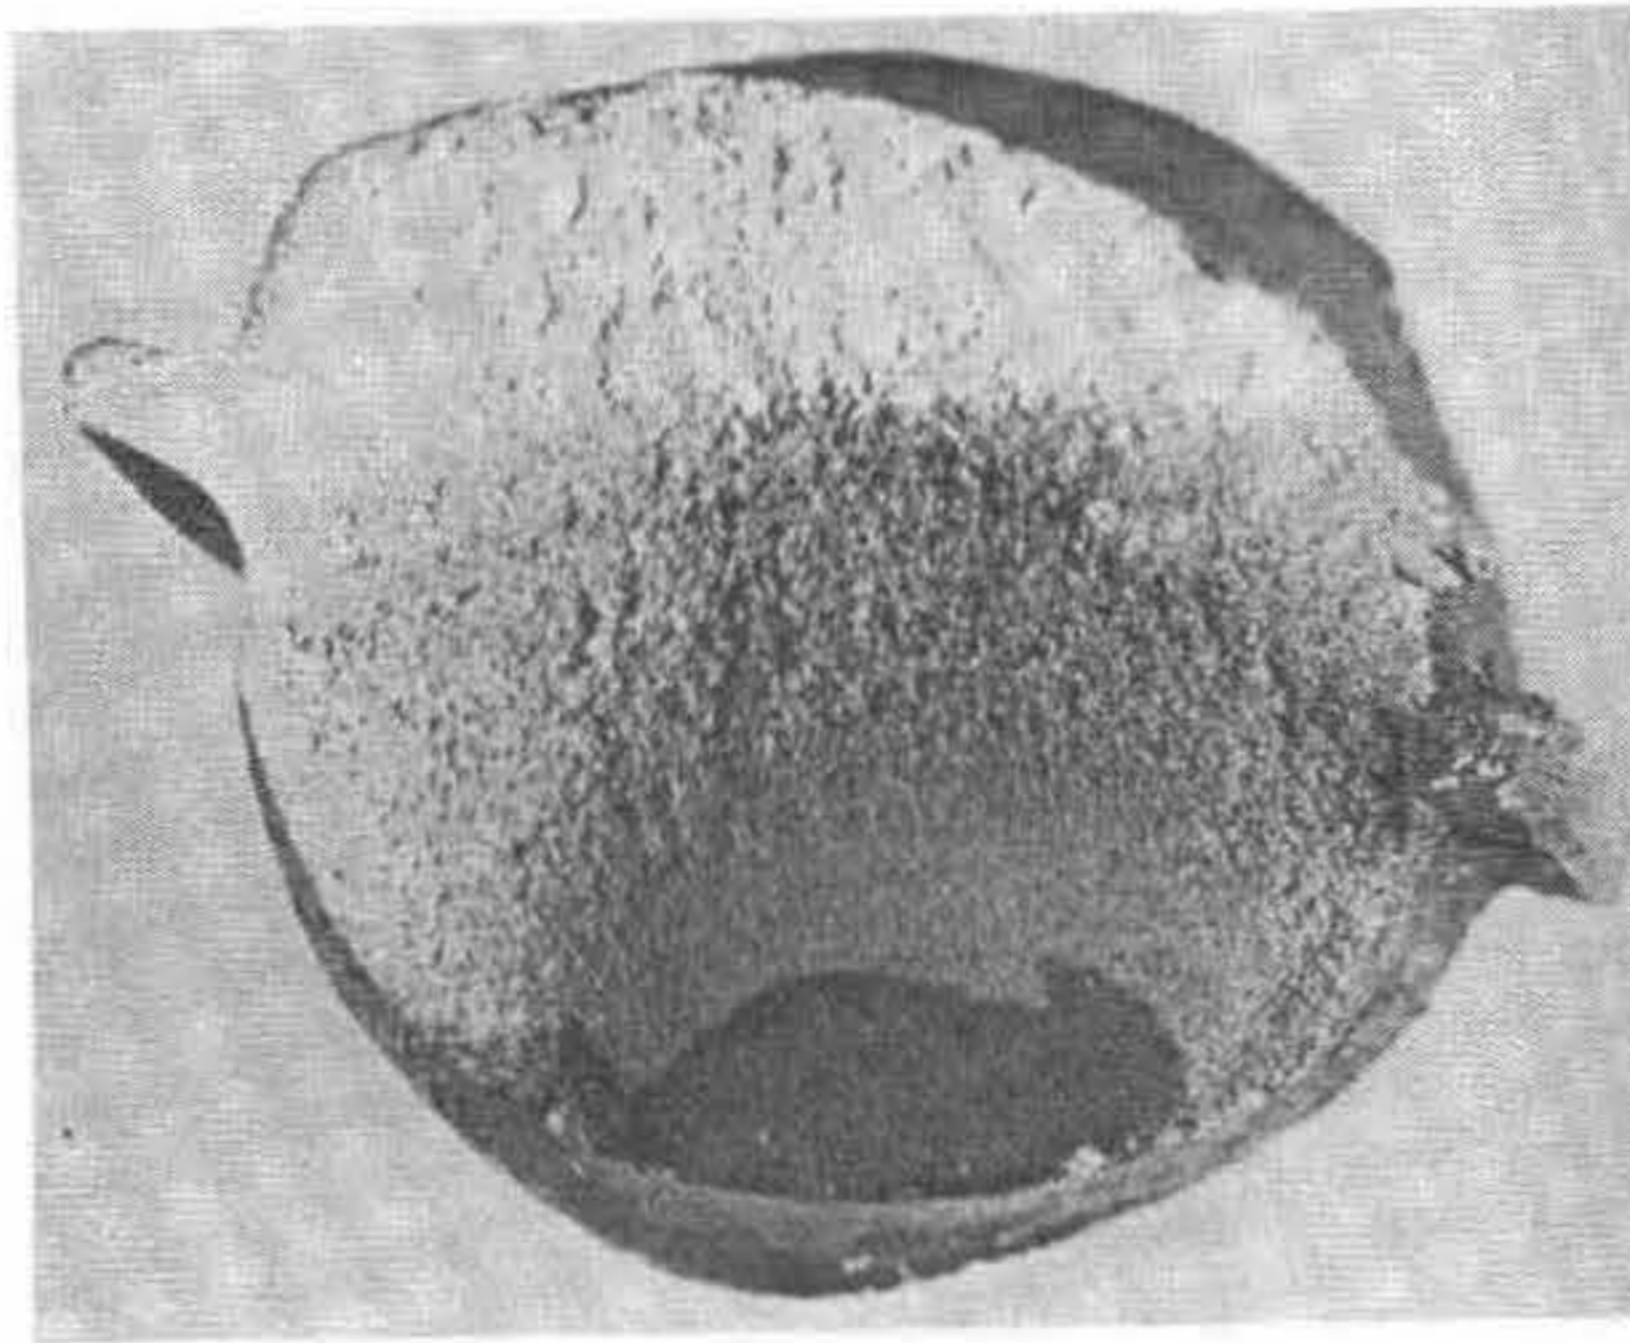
Fracture of hot-rolled bar (after Tilly 1979)
